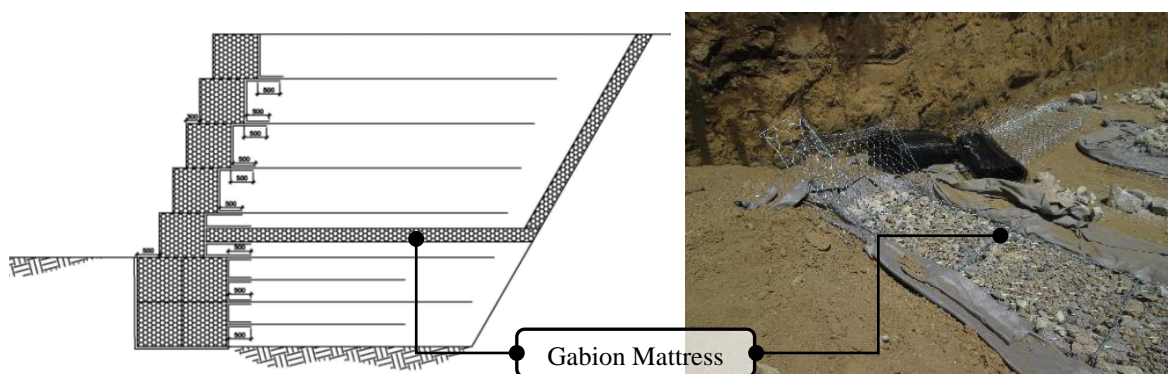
Typical RSS section with subsurface drainage and sample photo of gabion mattress
